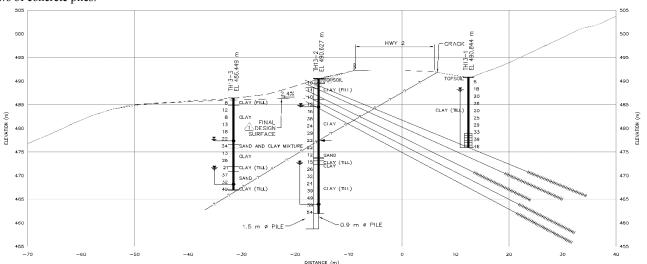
Cross-section through wall showing soil stratigraphy and anchor design.
